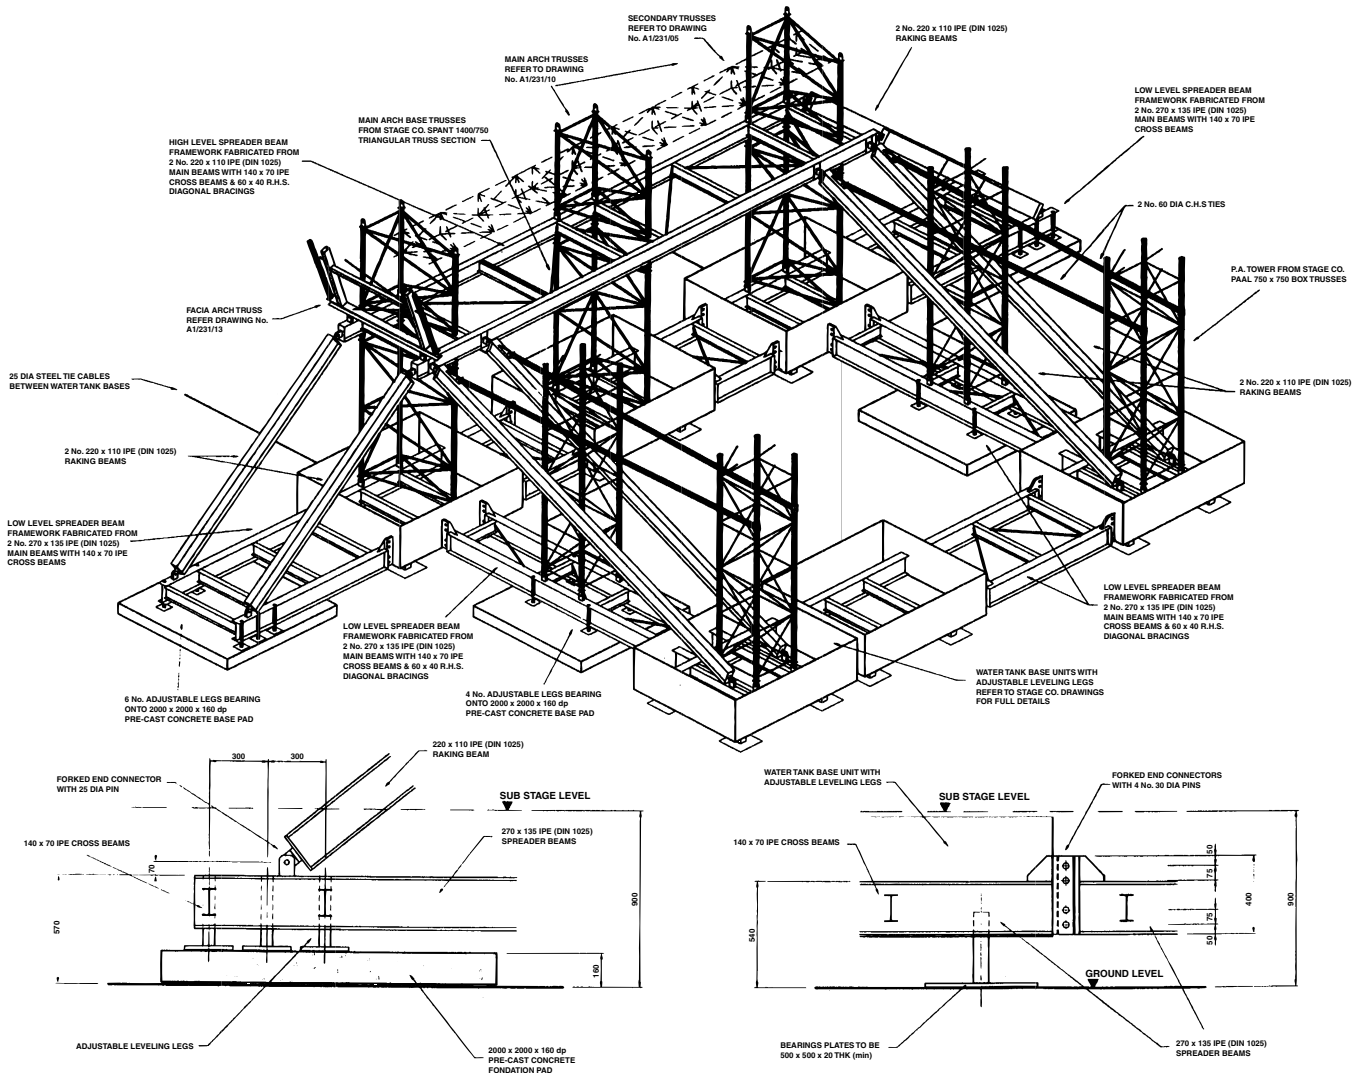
'Division Bell' tour set, movable foundation details. Adjustable legs are stabilised by water tanks.
